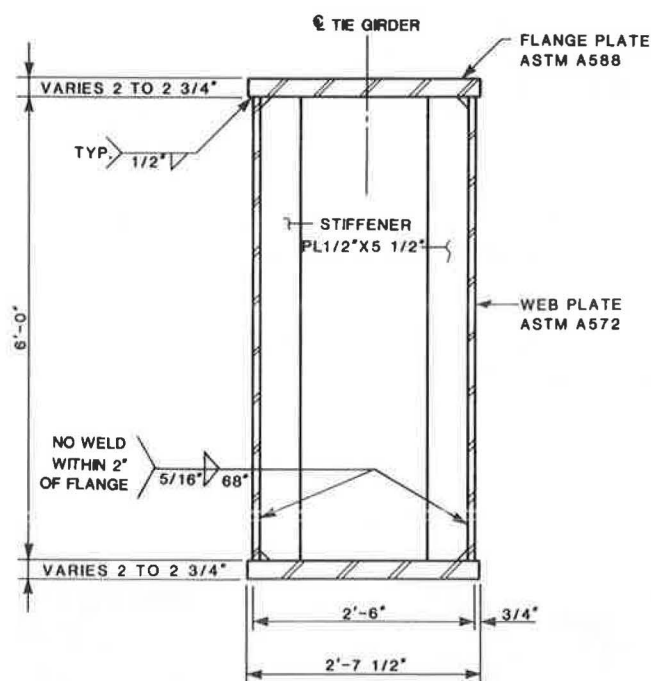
Cross section of tie girder at typical intermediate stiffeners.
